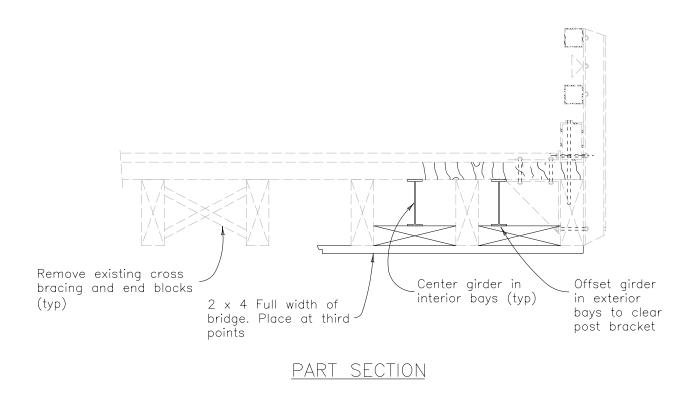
(H)-3 Sample Section of adding steel girders to a Timber Bridge
